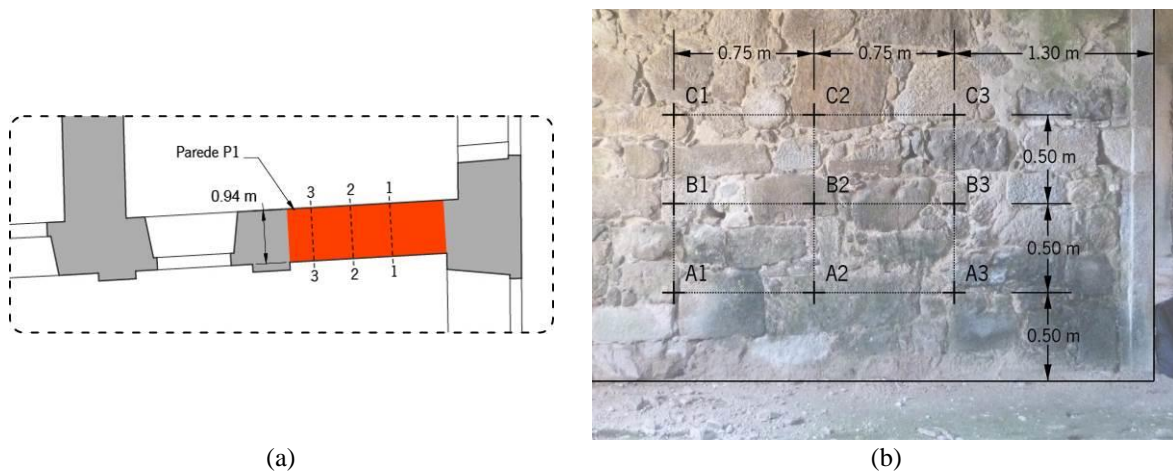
Set-up for the direct sonic tests through the wall in the San Francisco Convent wall: (a) plan of the tested wall; and (b) distances between the grid points on the wall
